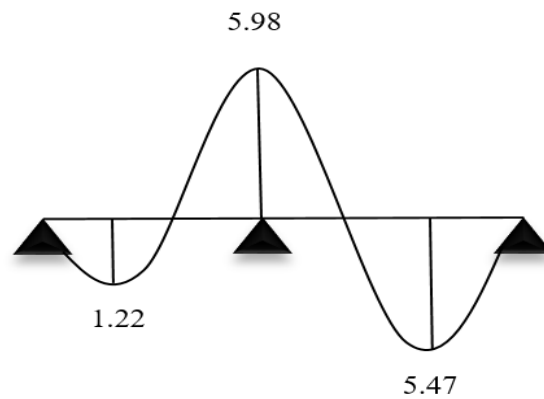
SLS moment diagram - beam Type 3 (current floor)
